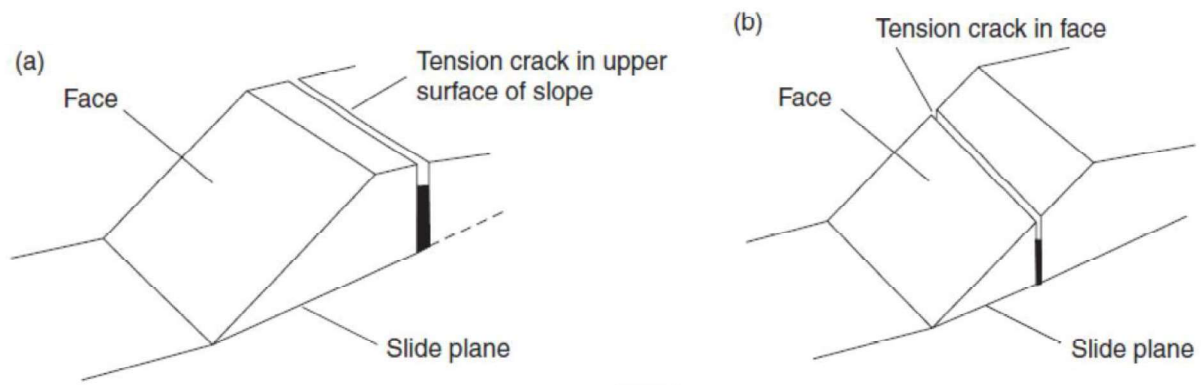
Tension crack in upper surface of slope and in the face [23]
